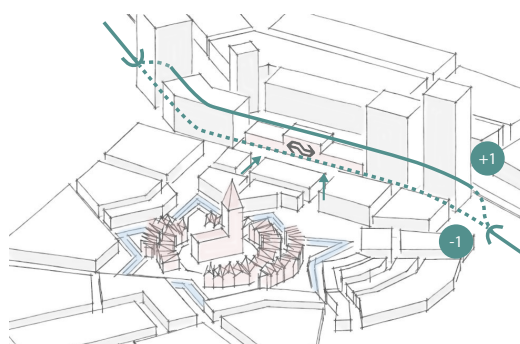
Underground or elevated railway tracks (own ill.).
